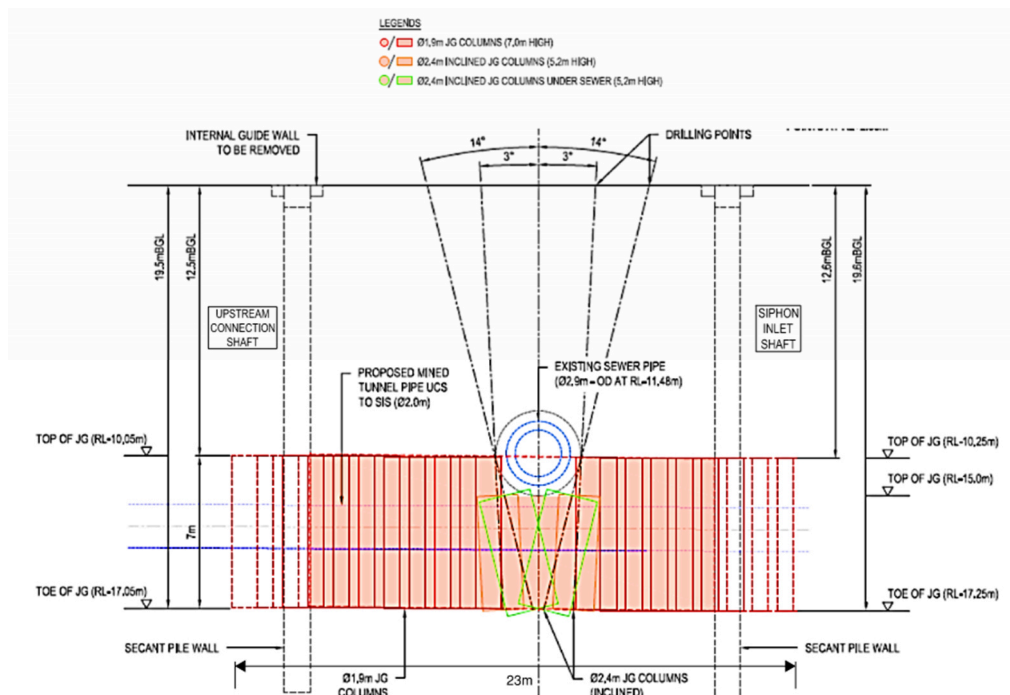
SEM tunnel treatment block with inclined jet grouting column underneath the abandoned sewer (Menard 2022)
